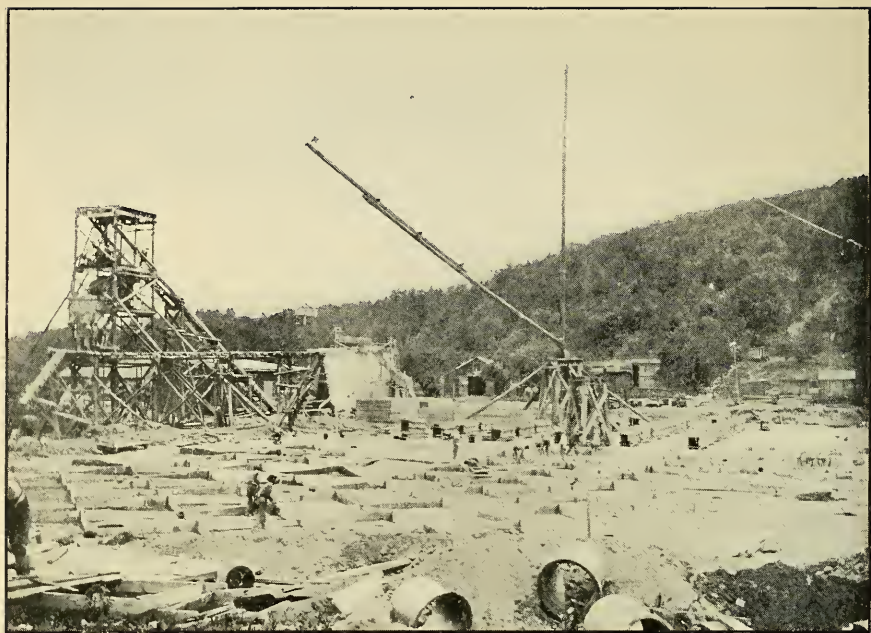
METHOD OF PLACING FILTER FLOOR CONCRETE.
